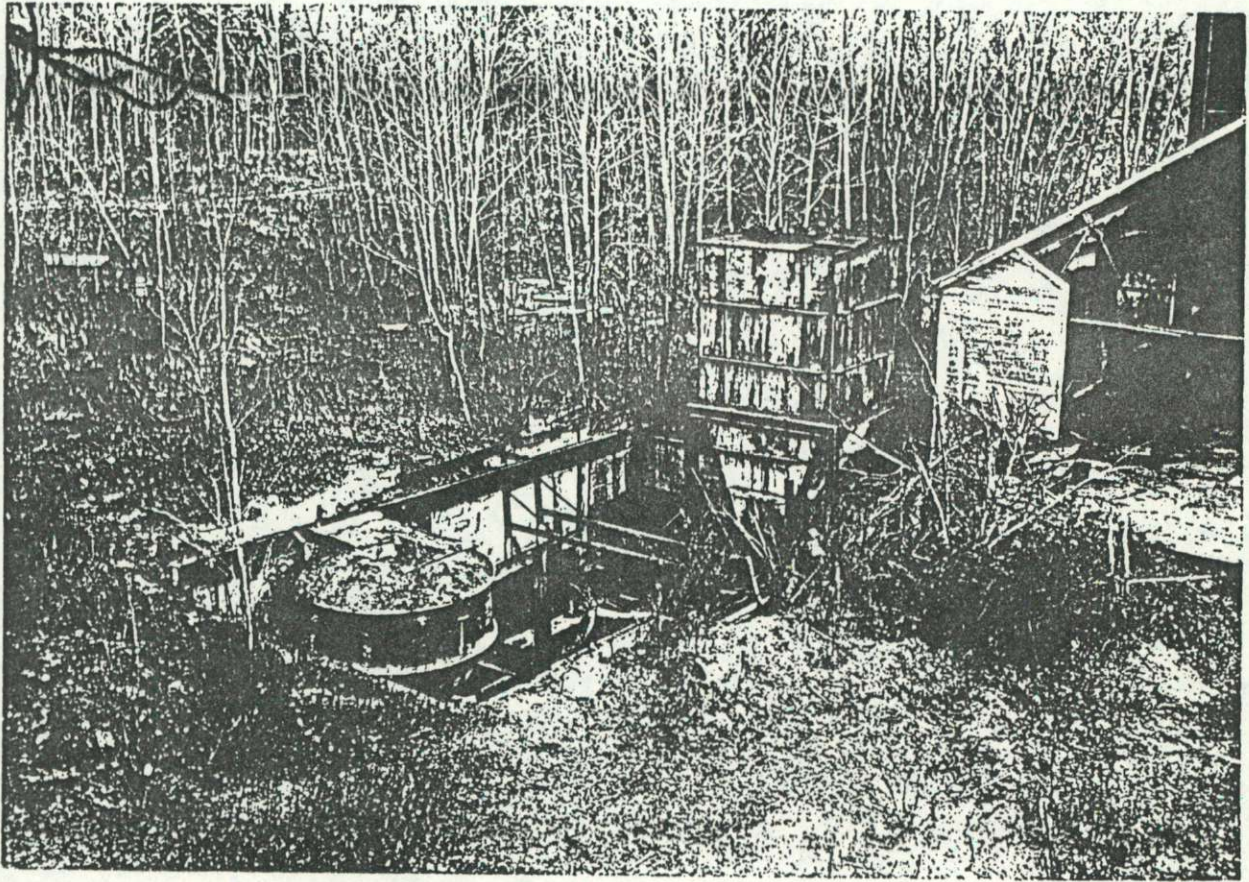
Hoppers Within Foundation Off Northwest Corner of Processing Plant;
